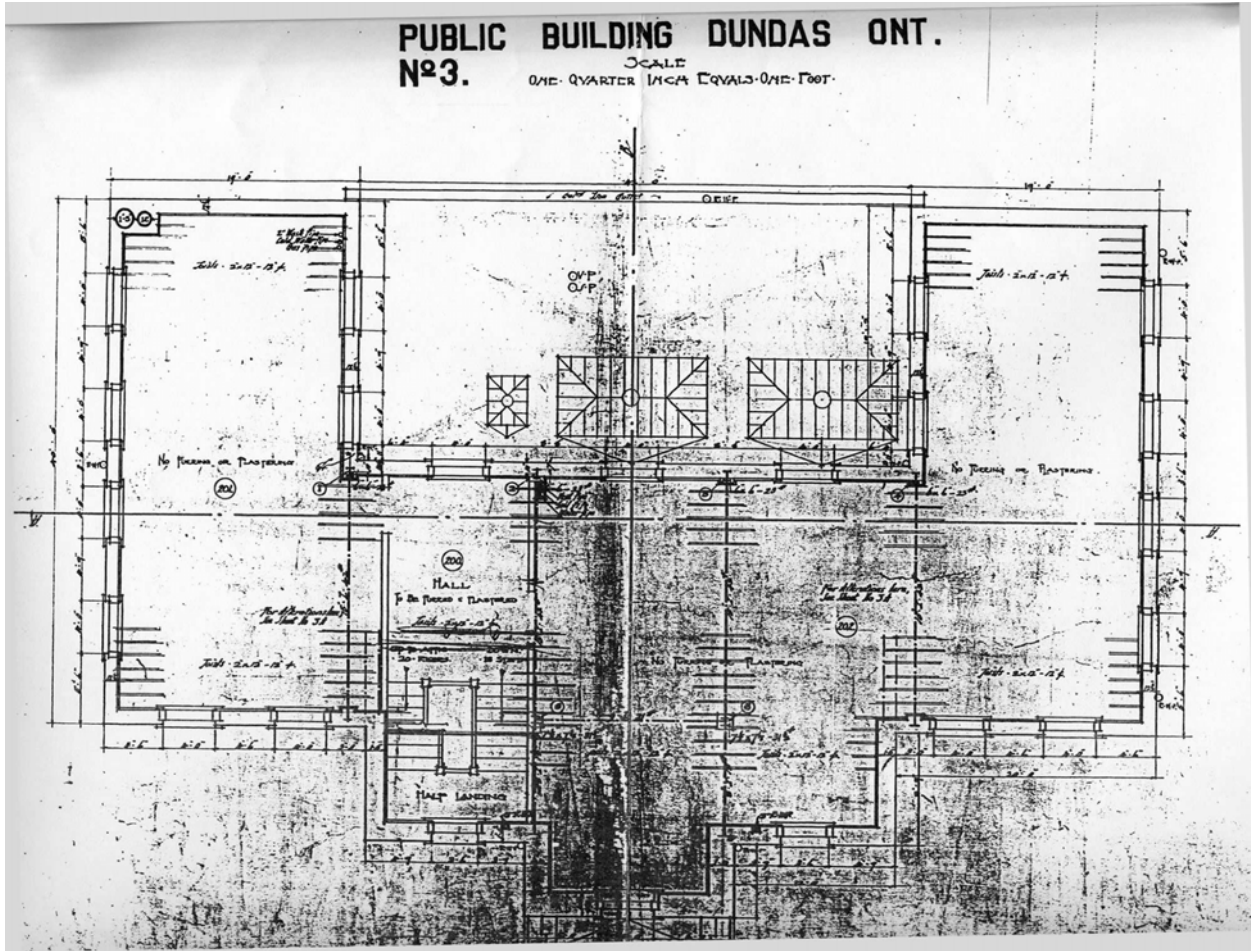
Drawing No. 3: Second Floor Plan (1911), showing the floor as initially left in a largely unfinished condition.
